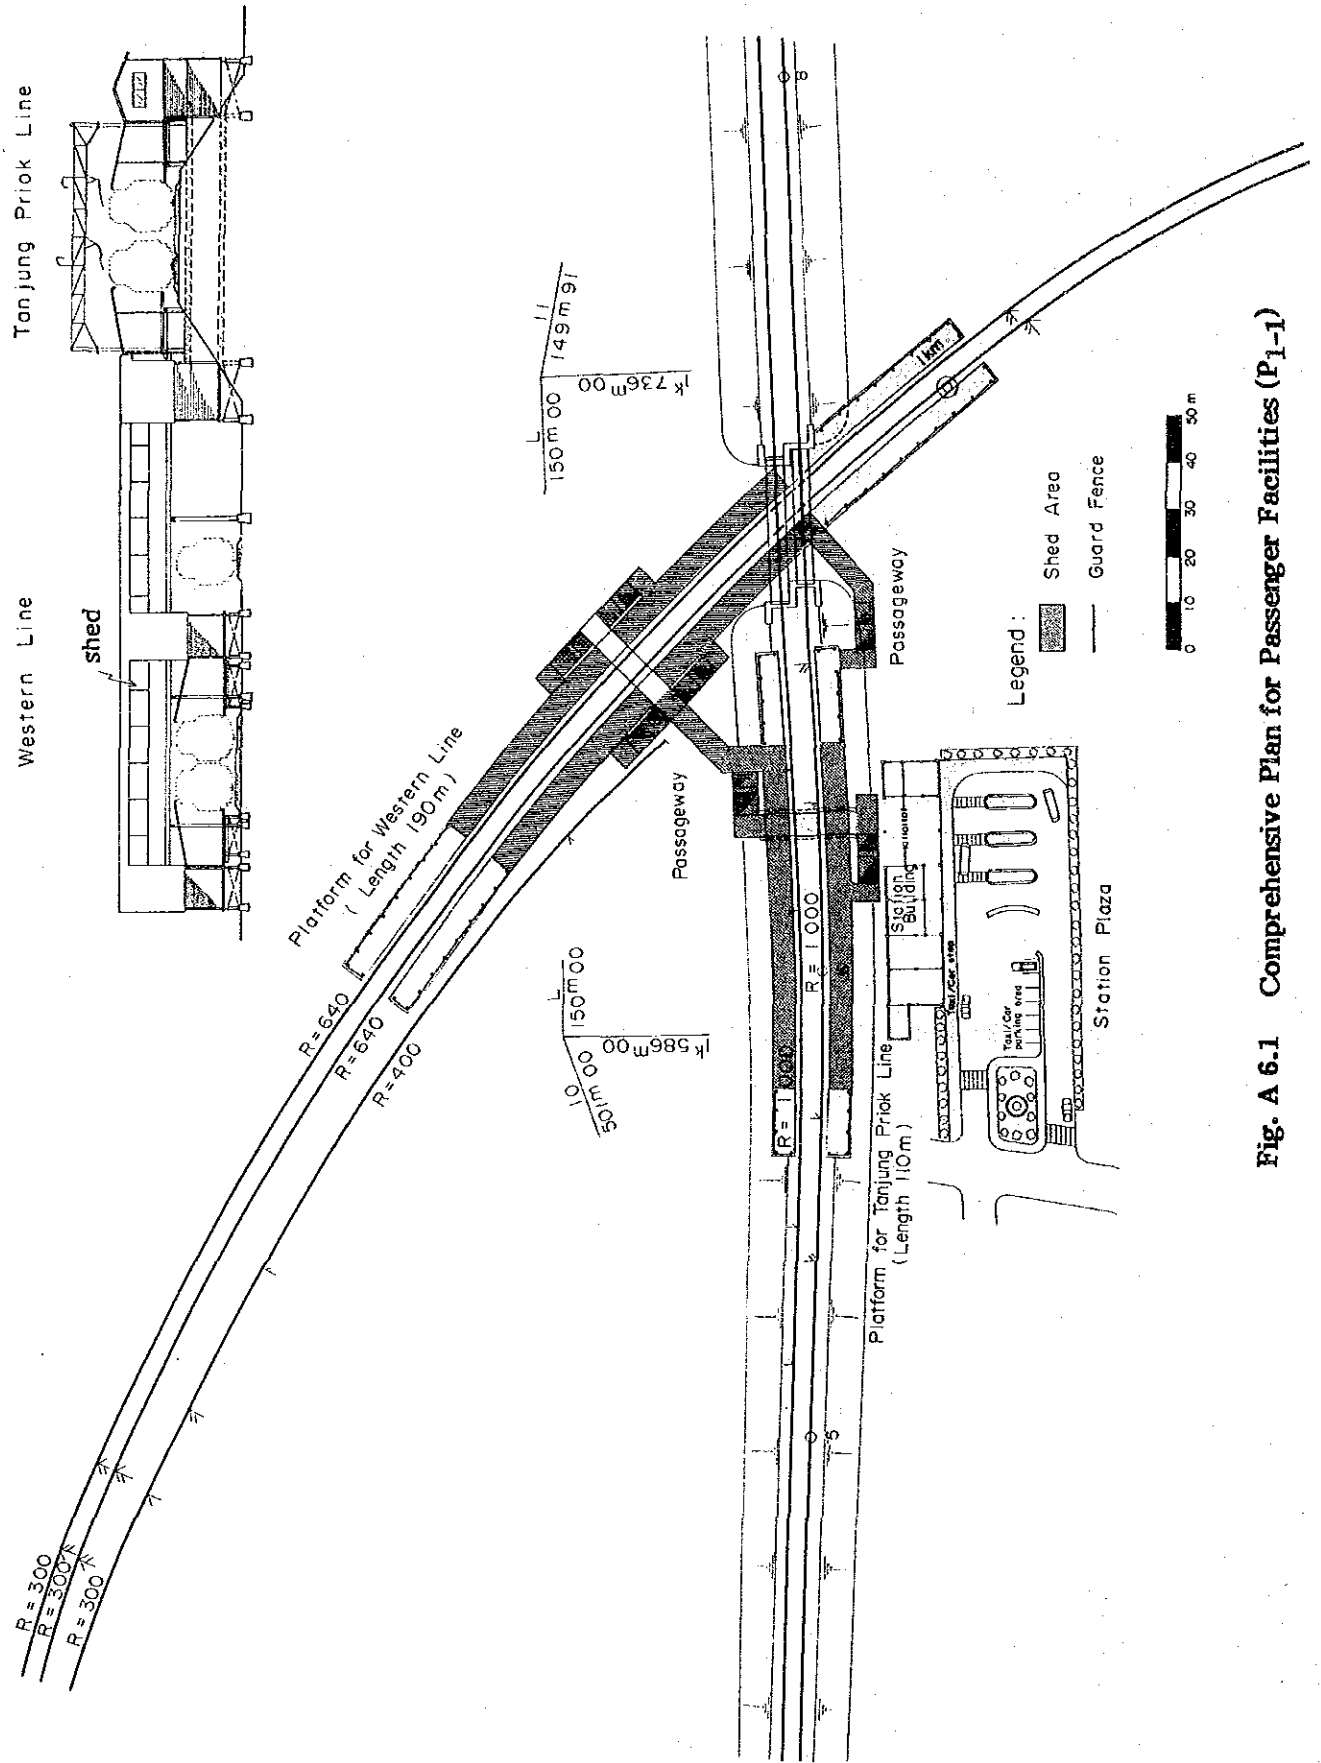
Comprehensive Plan for Passenger Facilities (P1-1)
